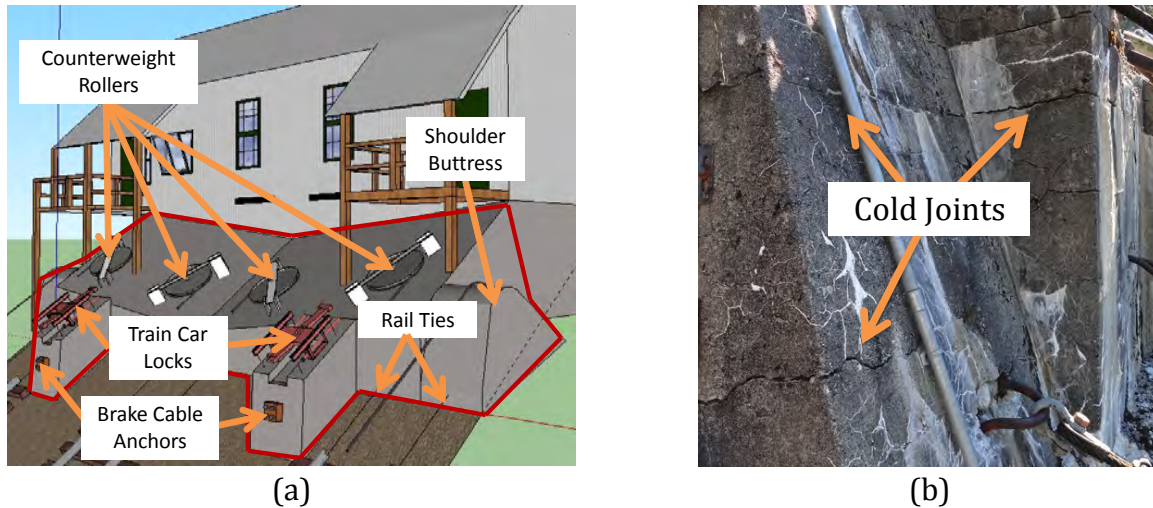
Hoist House (a) Schematic showing the Five Areas of Concern and Concrete Foundation (Outlined in Red) and (b) Exposed Deteriorated Concrete
